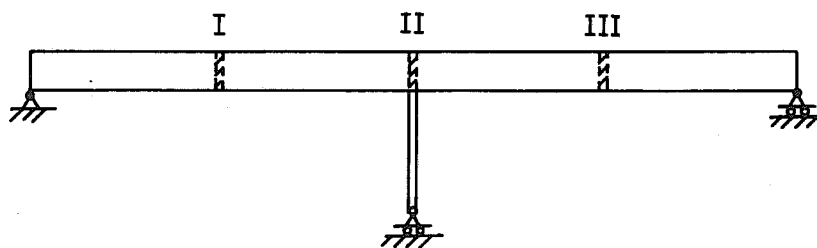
BOX-GIRDER BRIDGE WITH TWO INTERIOR DIAPHRAGMS, I AND III, AND ONE SUPPORT BENT, II
